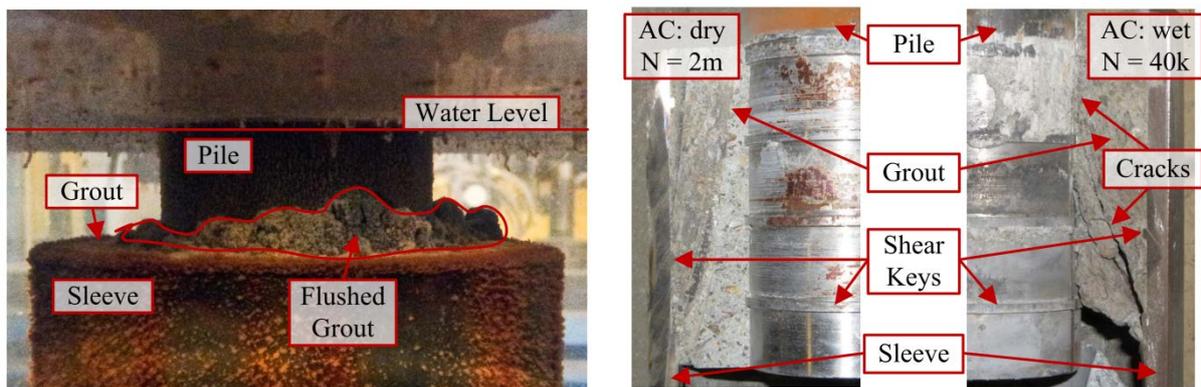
Flushed grout material on top of cyclically loaded submerged small scale specimen (left) and grout section of opened specimens tested in dry (left) and wet (right) ambient conditions
